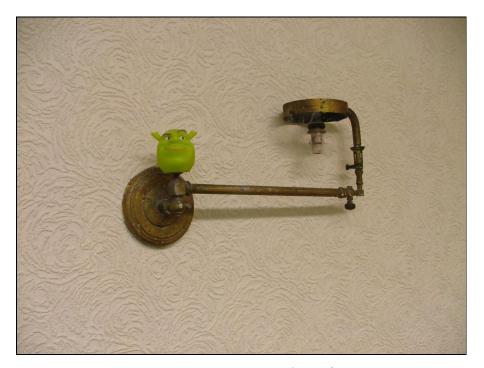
Remains of a gas light complete with 'Shrek', first floor of pele tower
